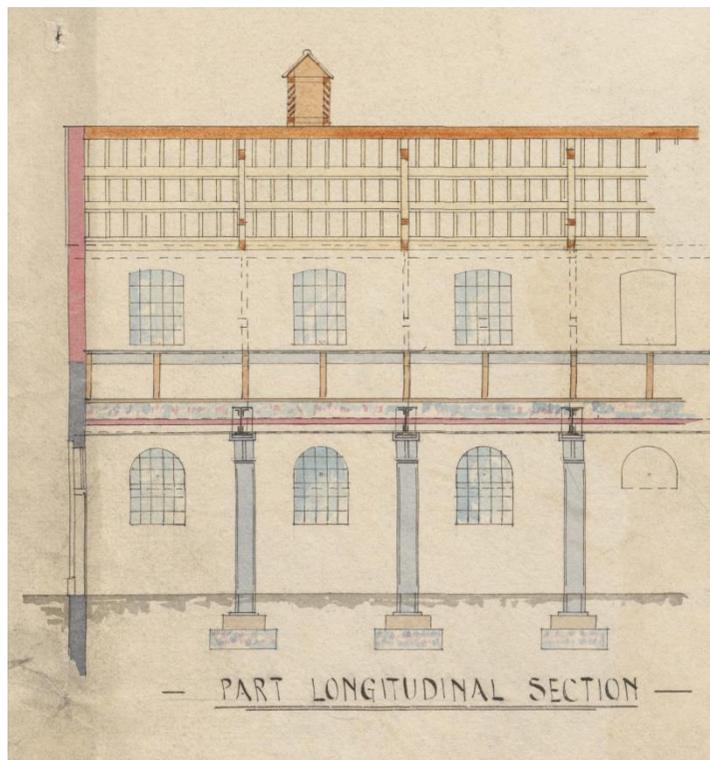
Detail of drawing. Long Stable - Longitudinal Cross Section.
